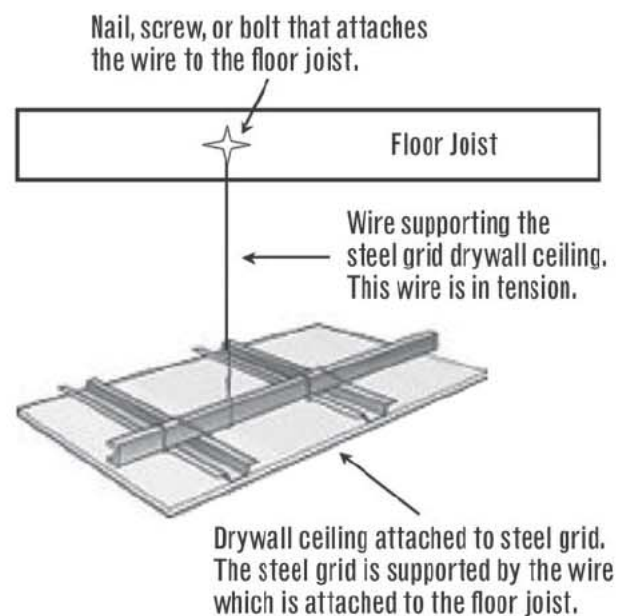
The wire that supports the drywall steel grid is in tension and is attached to the floor joist above.
